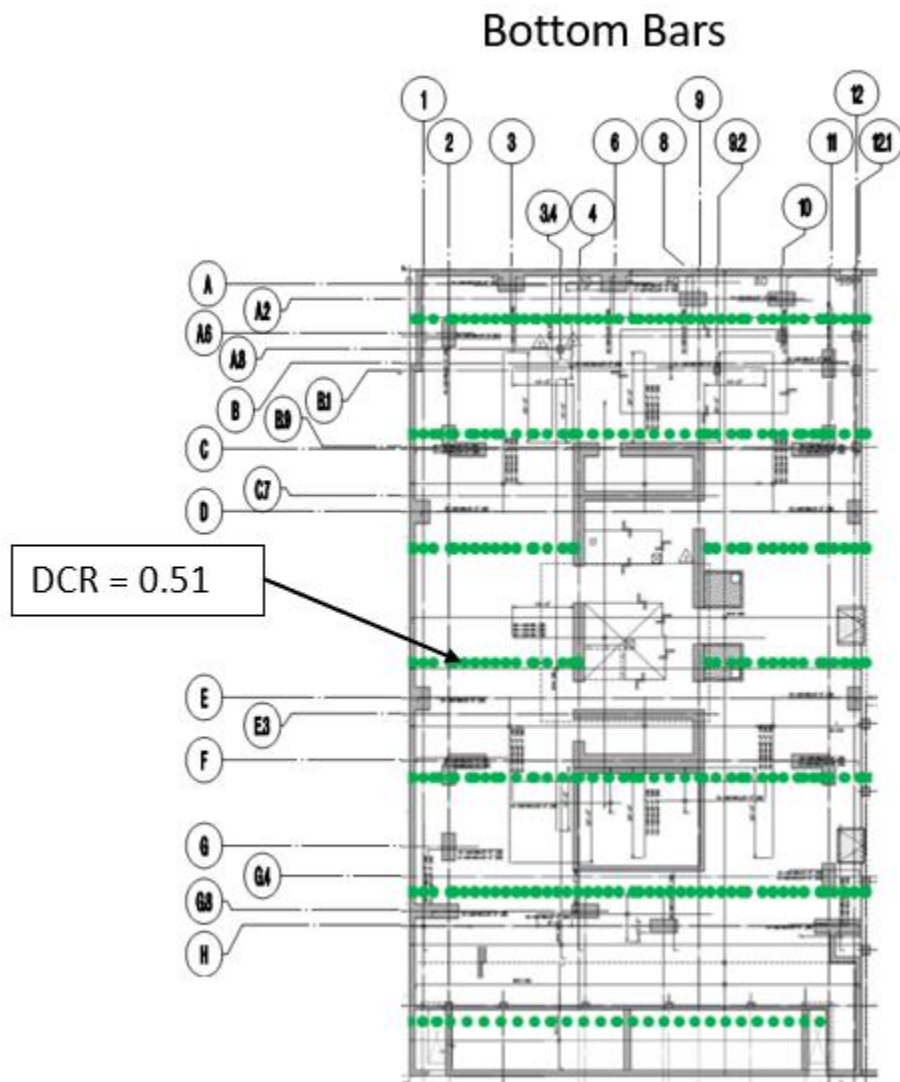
DCR Plot for East-West Bottom Reinforcement Design Strips for Gravity Load Envelope Existing Condition
